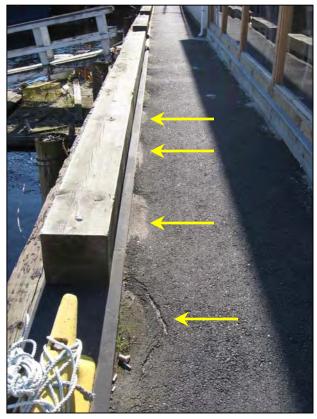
Timber curb and bituminous deck. Note several small areas of subsidence.
